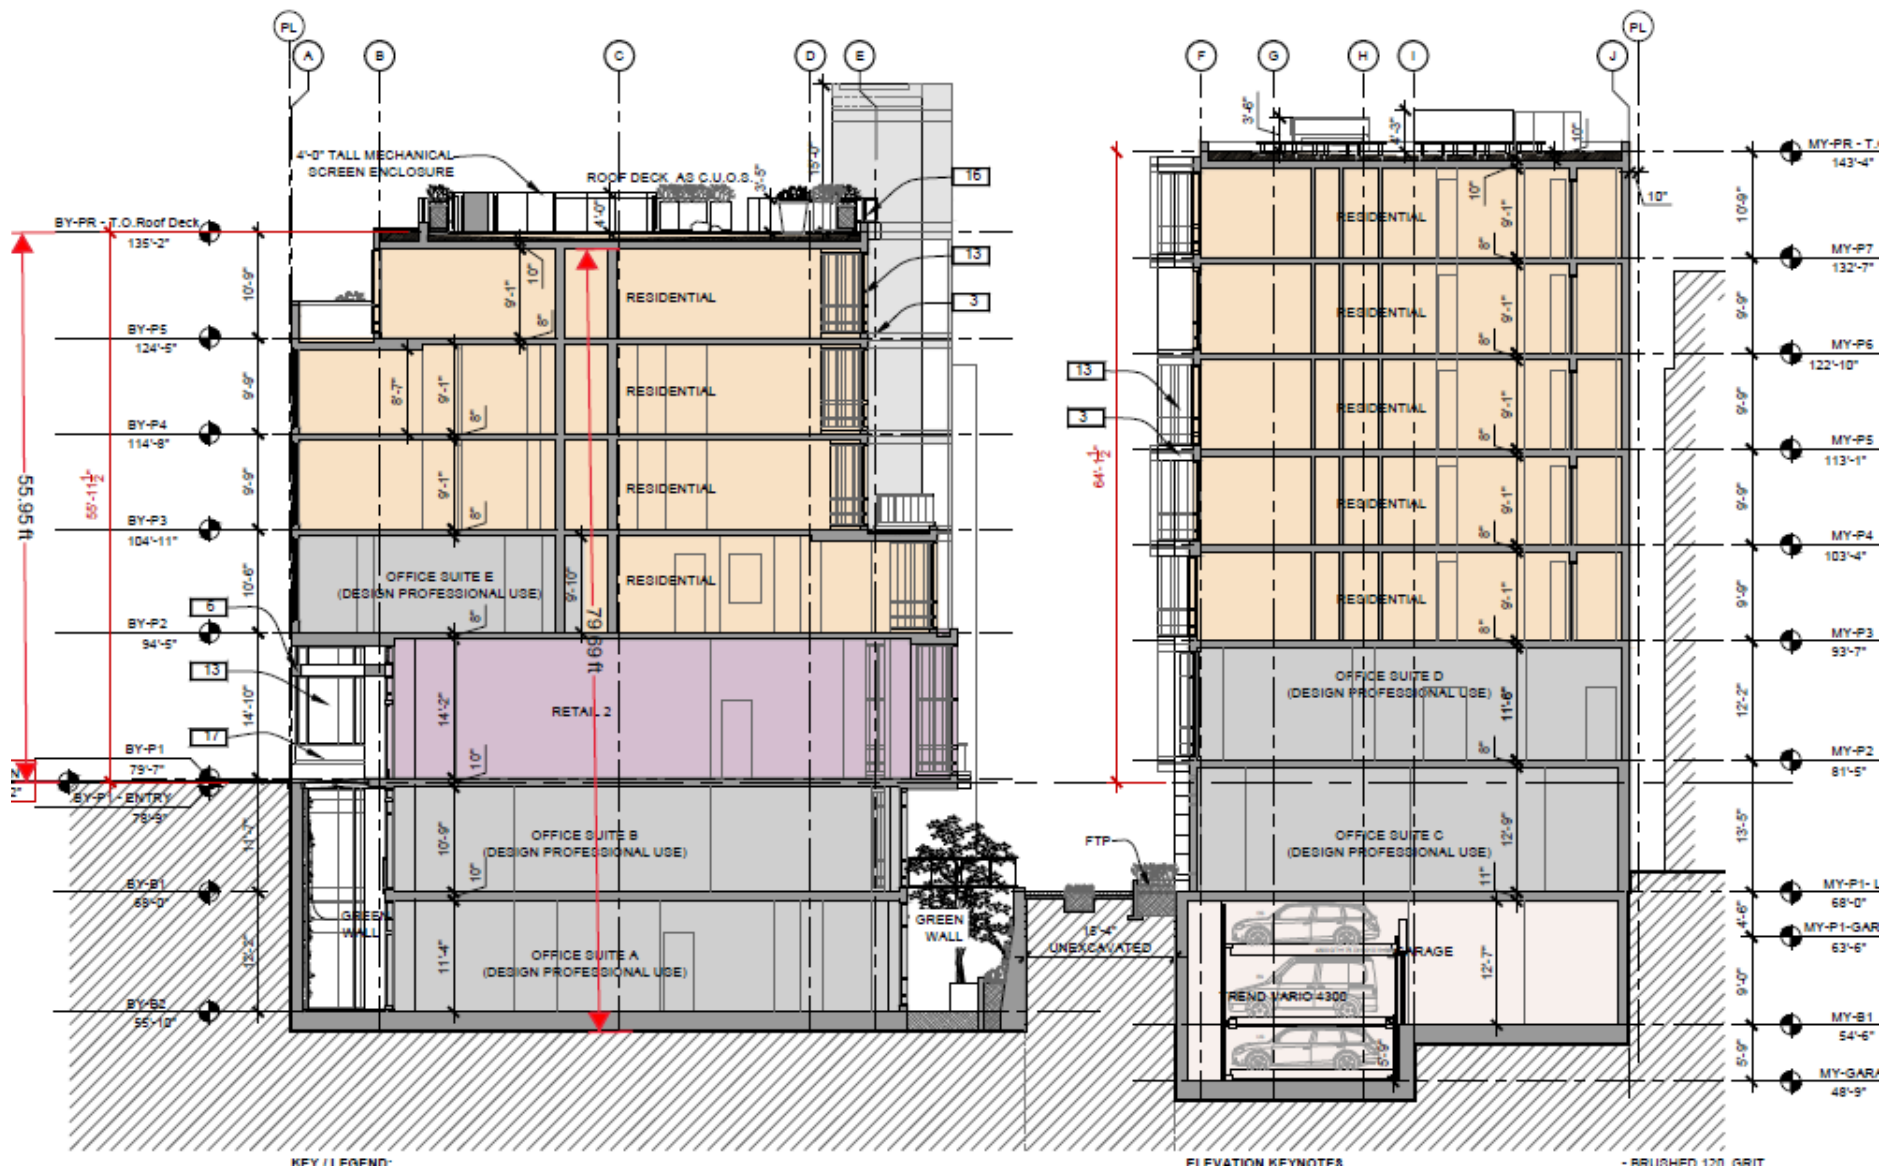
Section showing extent of proposed office space (gray shading), excerpted from project sponsor's plans
